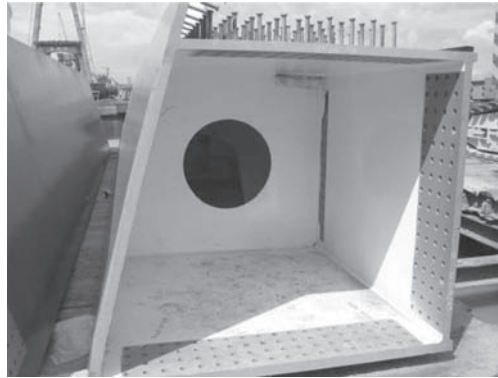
Clean space without any stiffeners on the webs or flanges is safe for people working inside the edge girder.
